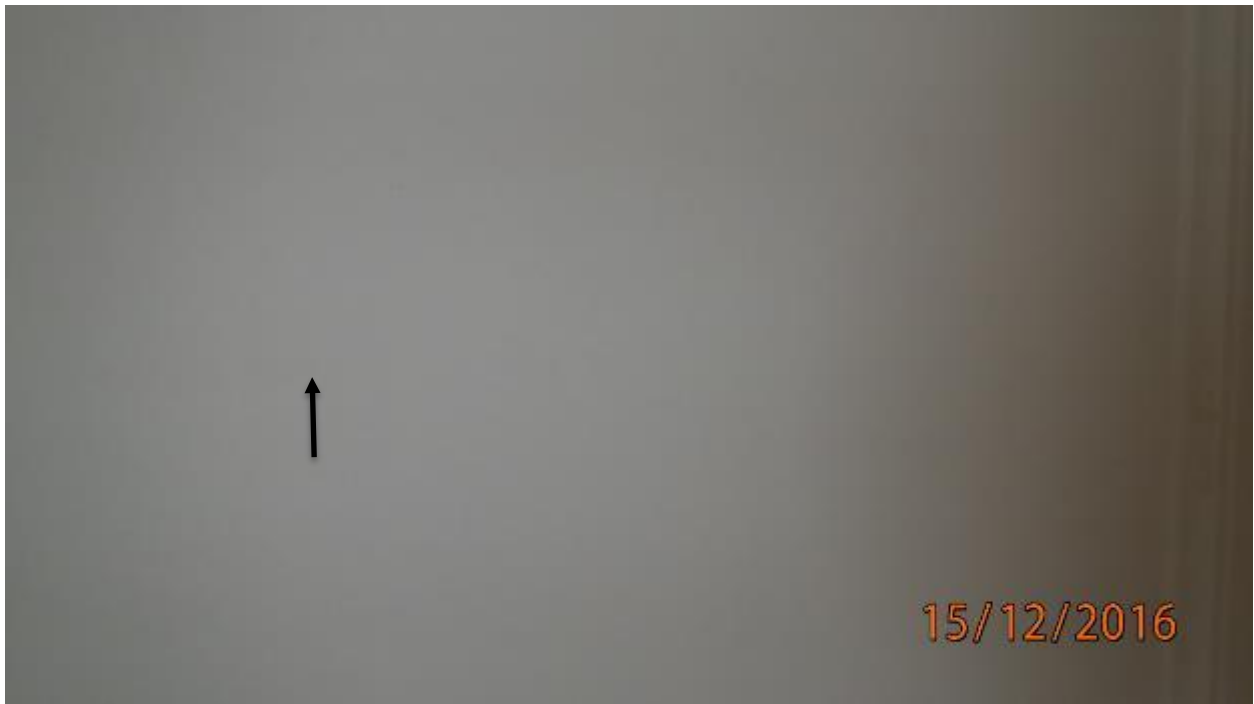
shows flaking paint to painted cement rendered eastern wall under the wide profiled plaster cornice in Bedroom 1.
